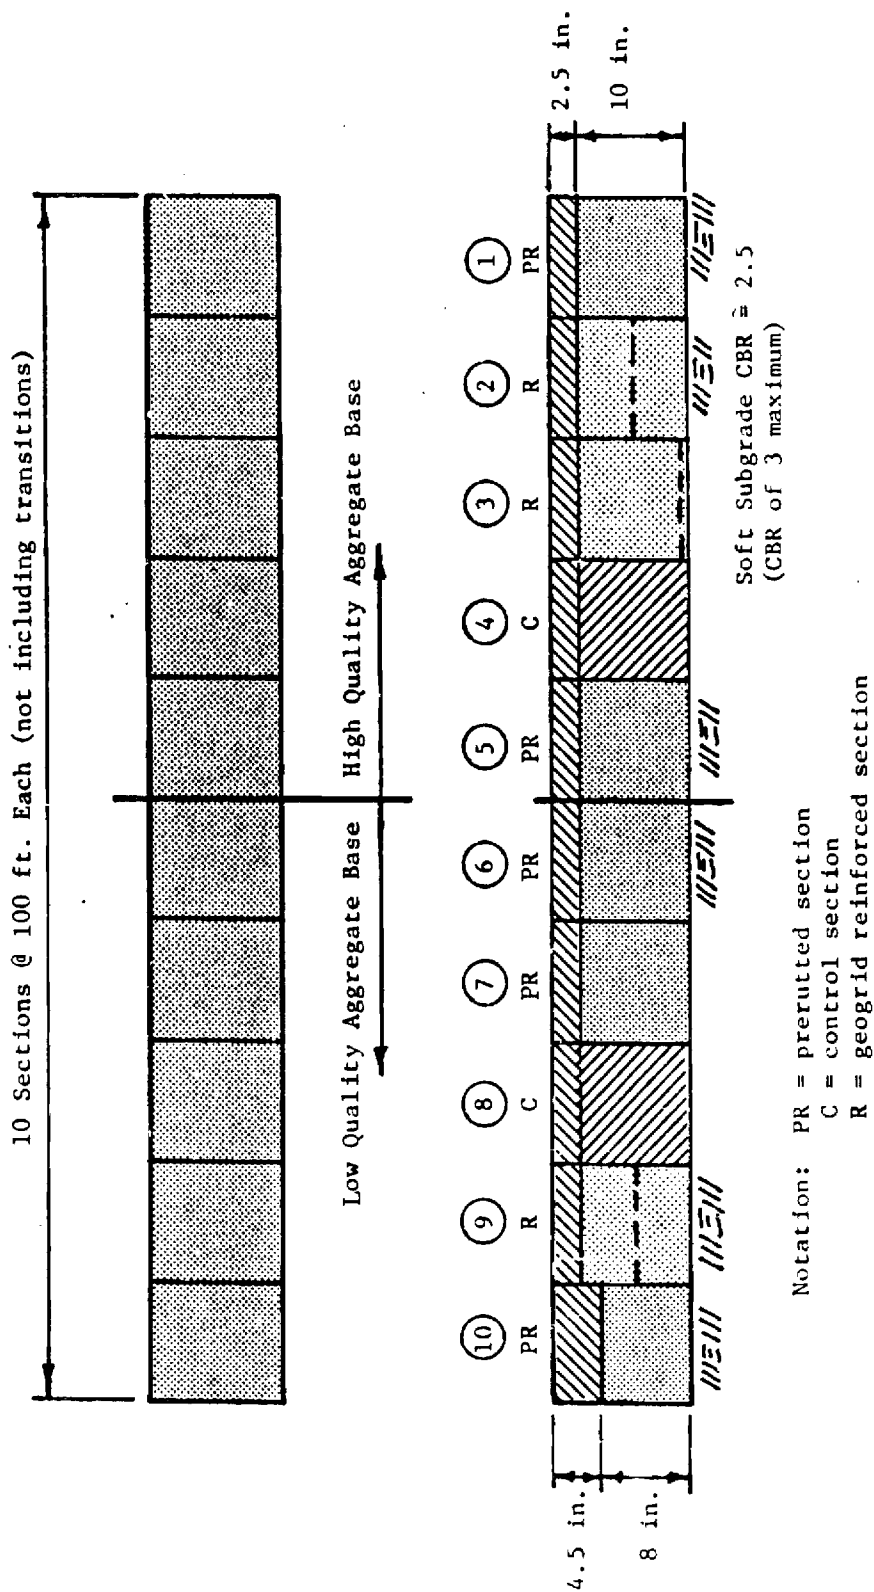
Tentative Layout of Proposed Experimental Plan - Use of Longer Sections and More Variables are Encouraged.
